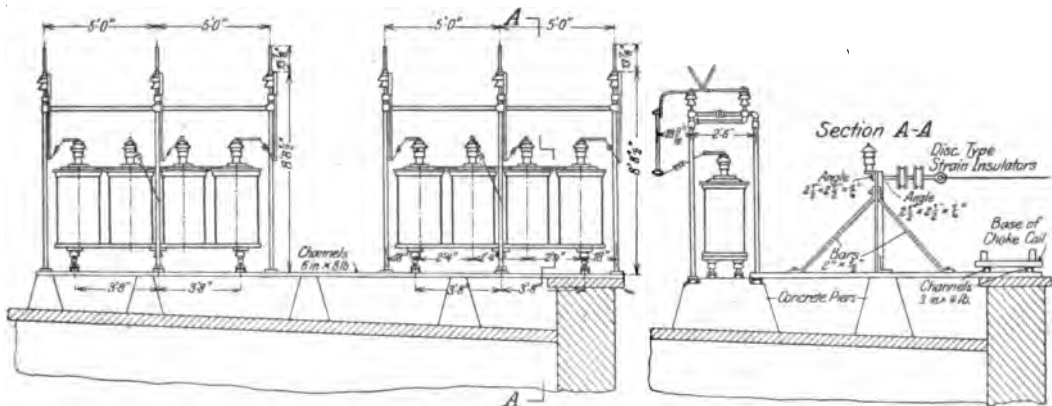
Diagrammatic Drawing showing Steel and Constructional Details of Frame for Electrolytic Lightning Arrester.
